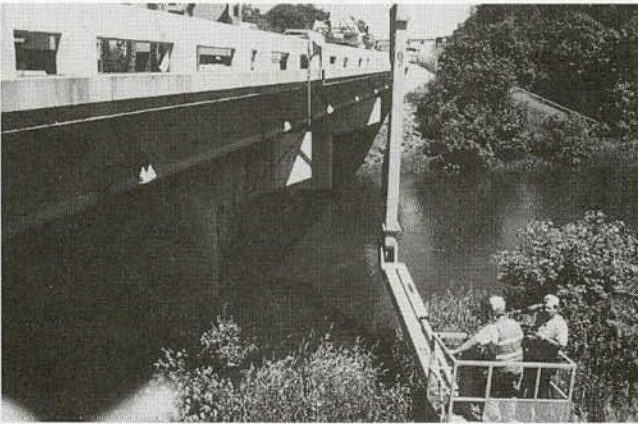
Installation of sliding collar device at Minnesota bridge no. 74004 (Site MN1).
